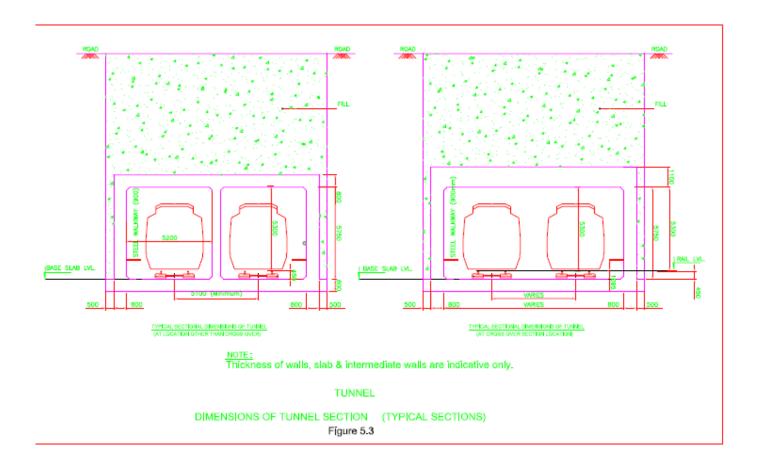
Typical Dimensions of the Tunnel Section (DPR, 2011)
